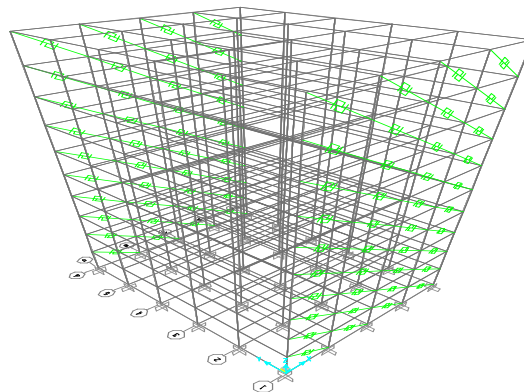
3D view of structure with Friction Damper installed in X-Direction
